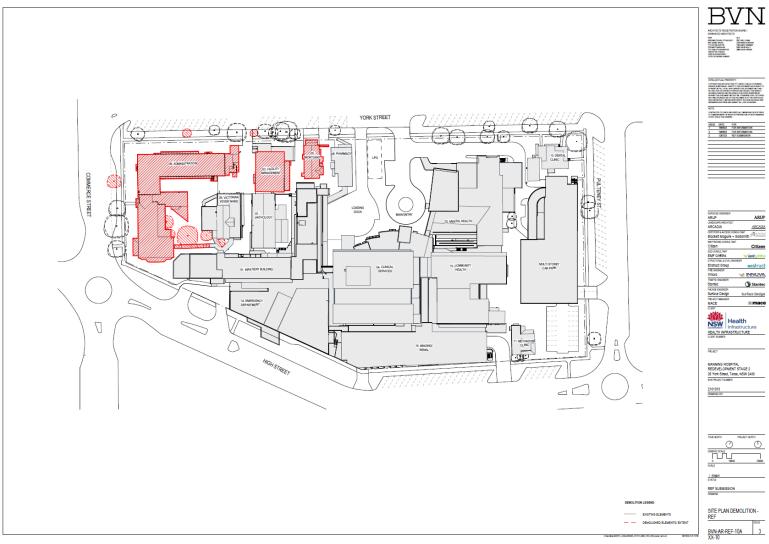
Excerpt from Site Demolition Plan – (Dwg BVN-AR-REF-10A, Issue 3). (BVN Architects, 12 July 2023).
